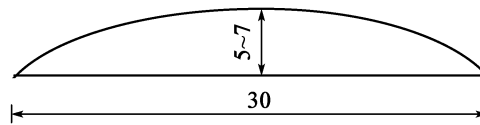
Schematic diagram of cross-section of bow-shaped barrier (unit: cm)
